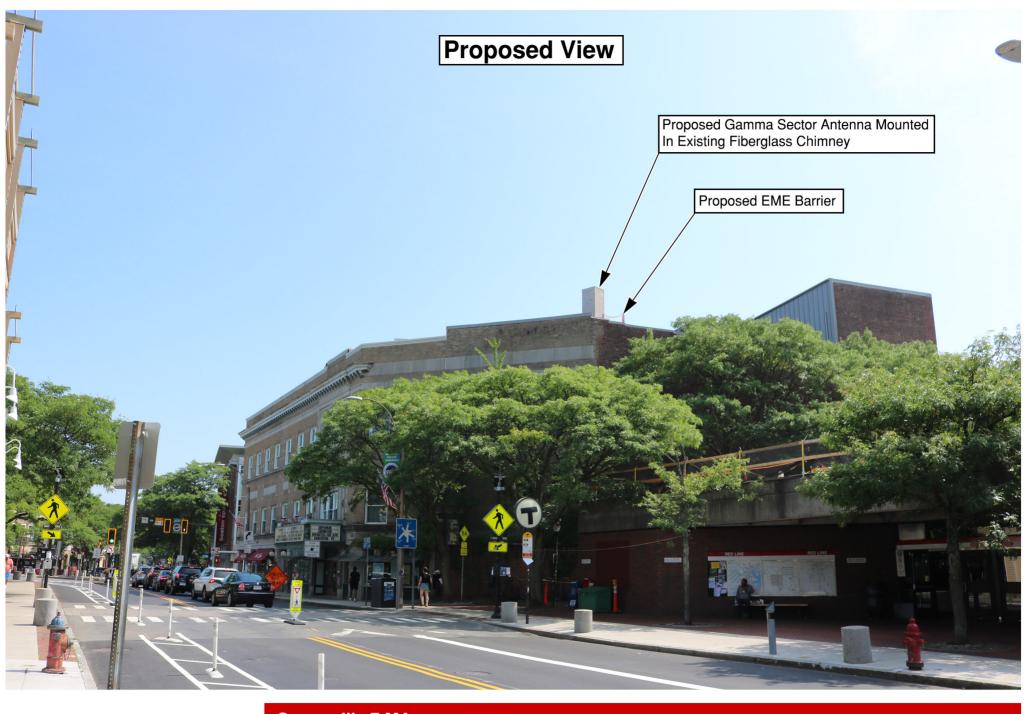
B View Facing South From Holland Street (Page 4 of 8)
